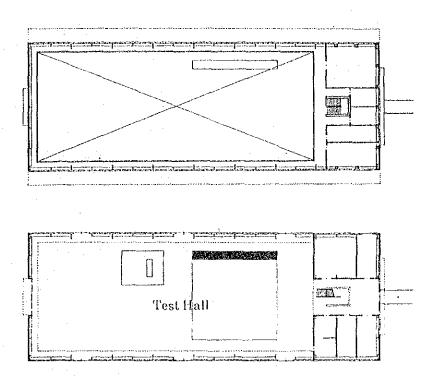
First and Second Floor Plans of the Structure/Earthquake Laboratory
